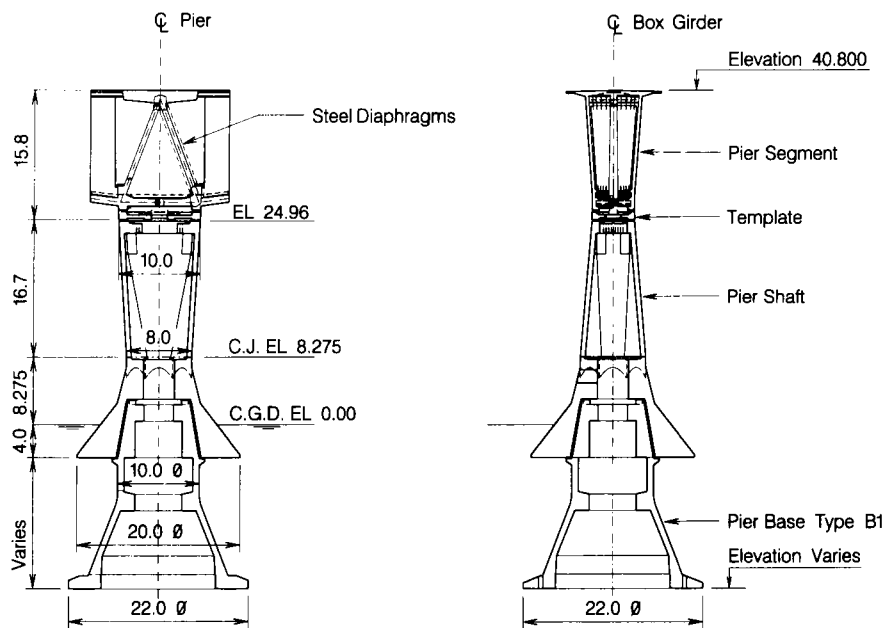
Typical pier, main bridge: *left*, longitudinal section; *right*, transverse section.
